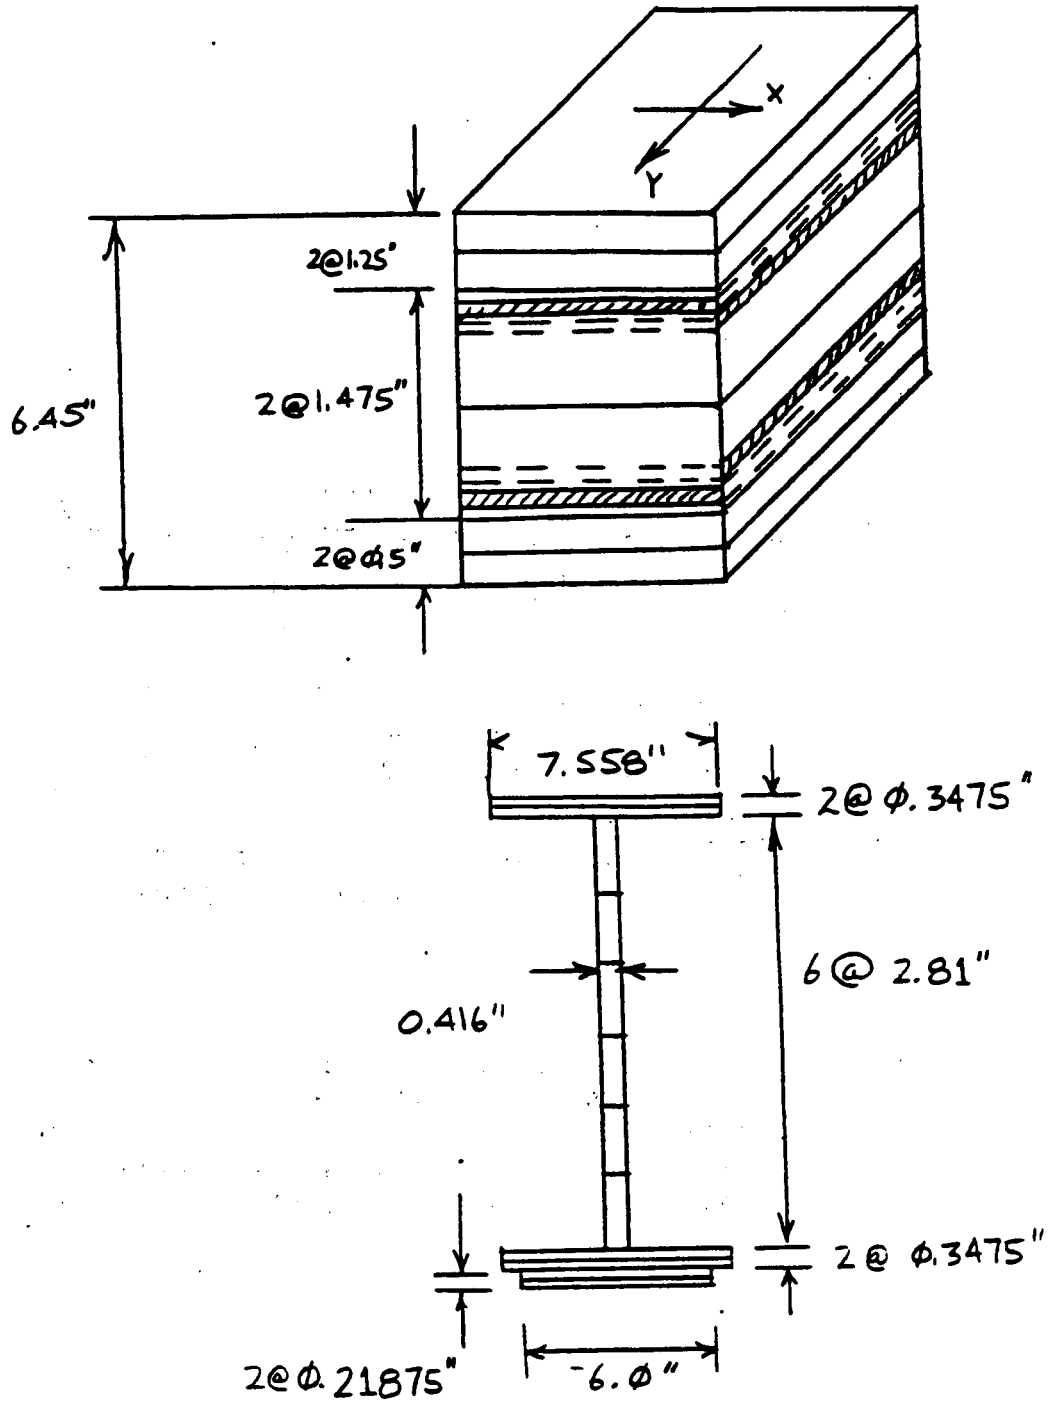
Example Problem 1 and 2 (AASHTO Bridge 3B), Slab and Girder Layering
